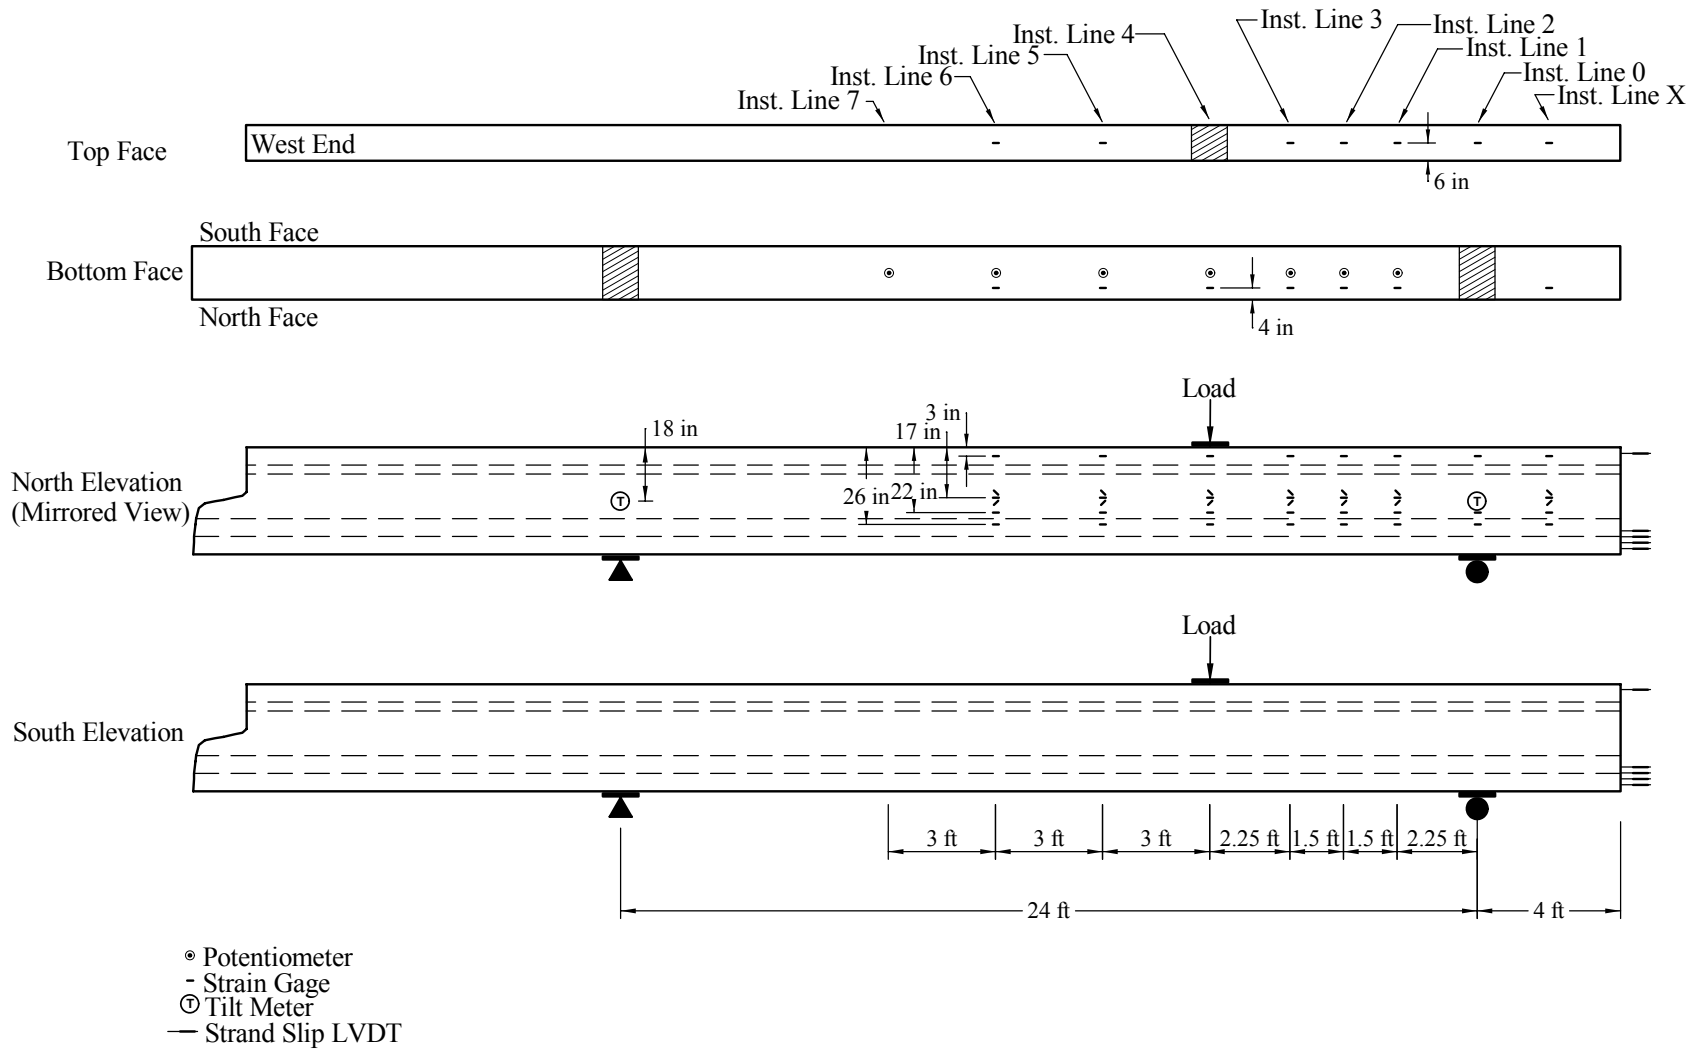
A: Instrumentation plan for Girder 24S
